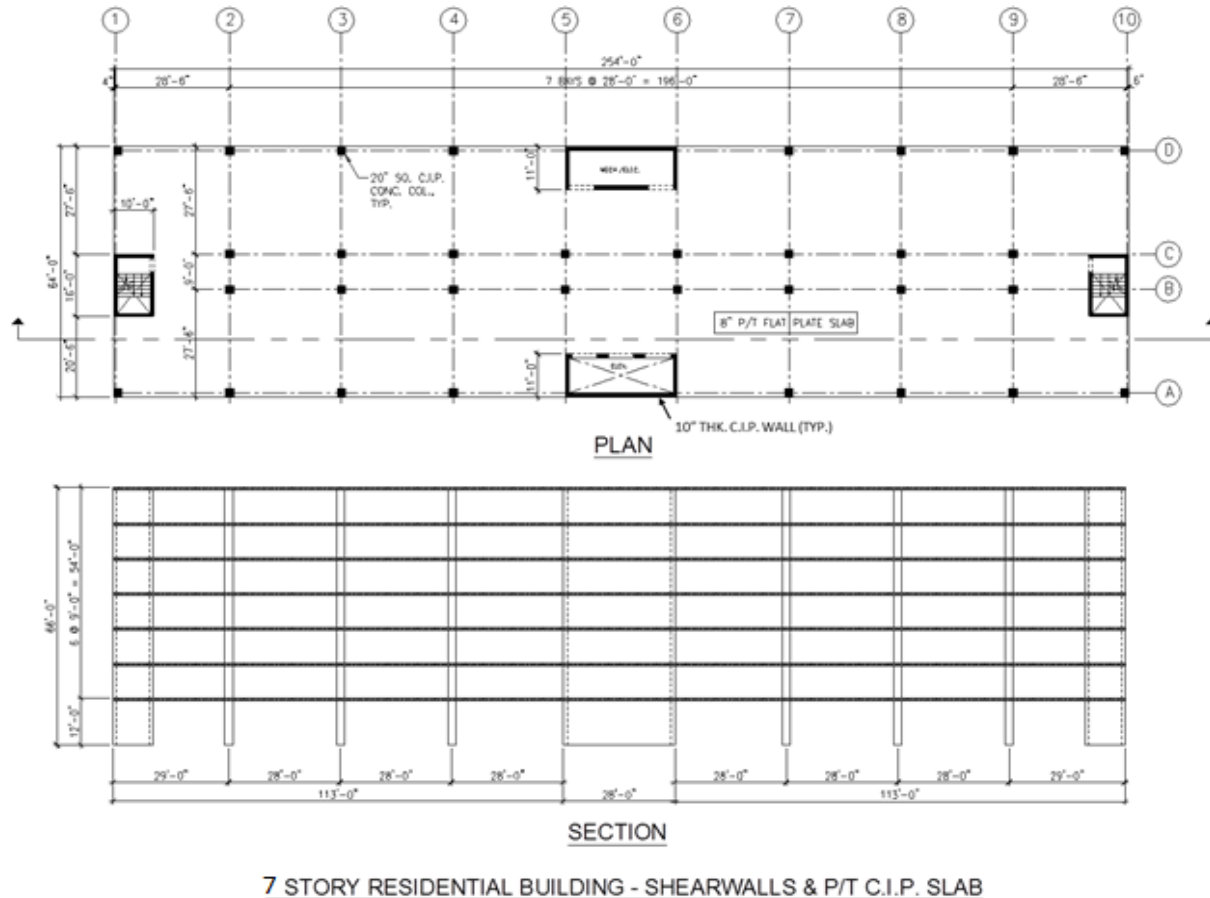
Prototype 7-Story Reinforced Concrete Shear Wall Residential Building - Plan and Section Views
